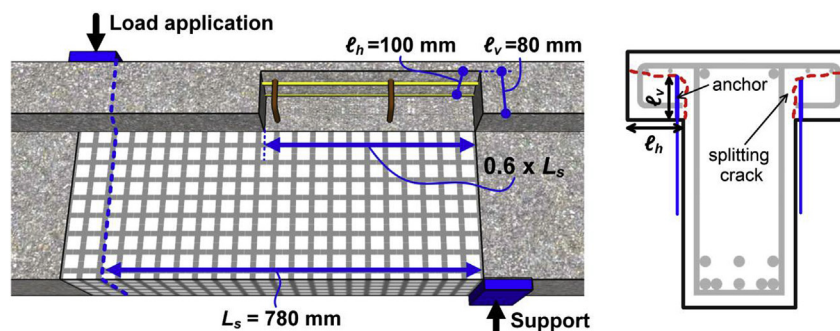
Concrete splitting area and length of splitting crack developed in specimen CH4_A100.
